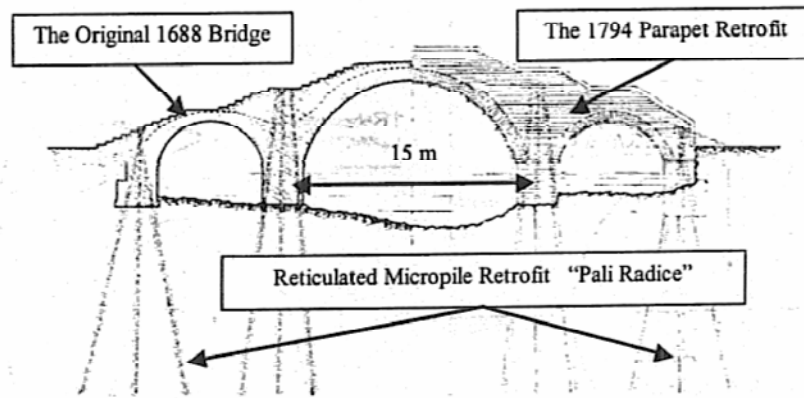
Composite view of original 1688 Three Arches Bridge, 1794 parapet retrofit, and reticulated micropile foundation retrofit in 1960.
